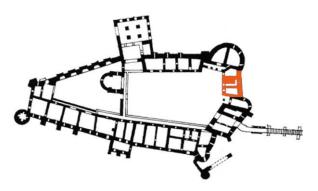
Janowiec Castle - the south suite of rooms External and internal wall coping in the western part: rebuilding with foreign calcite stone Internal walls in the east part of the premises: no protection provided.
